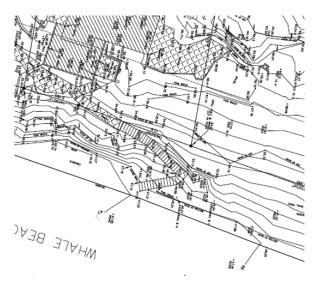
Existing pedestrian access from Whale Beach Road (Source: HSA)
